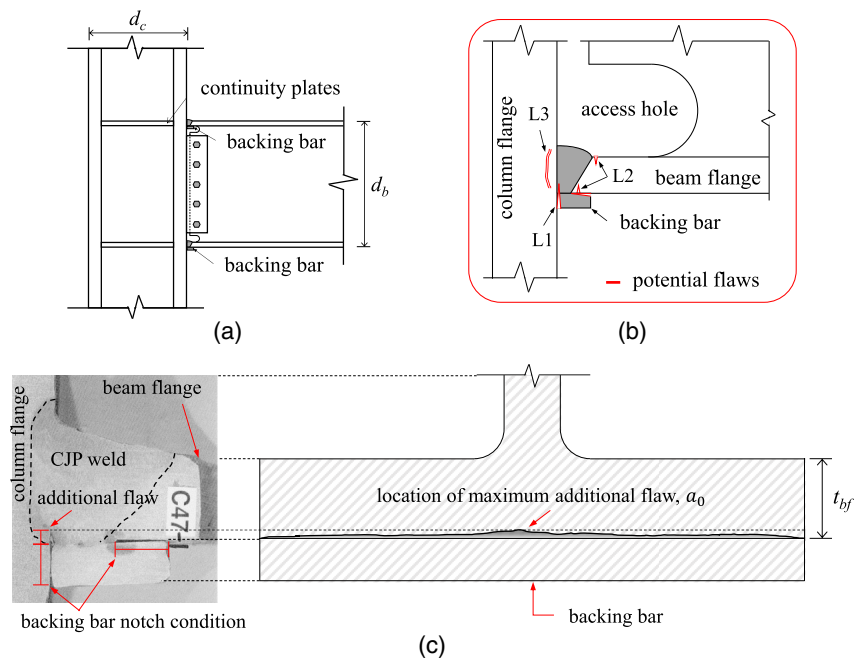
Welded unreinforced flange-bolted web (WUF-B) pre-Northridge connection: (a) typical configuration; (b) potential locations for crack initiation; and (c) typical bottom beam flange-to-column flange connection detail and schematic of additional flaw profile along the beam flange width (data from Paret 2000, © ASCE).
